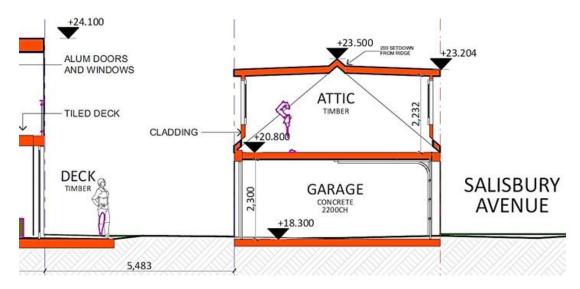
Section of garage/studio buildings approved at 38 Princess Avenue.
